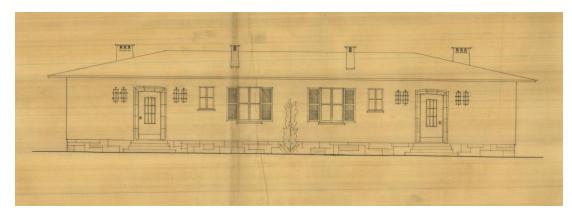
The implemented drawing of the double dwellings of officers, the south elevation, Mehmet Güney, Construction Section in General Directorate of TEKEL, 09.05.1947 (Source: TTA Archive)
